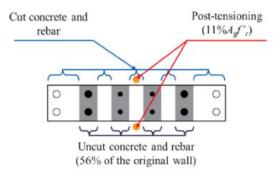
Wall Base Cross Section, (Basereh et al., 2020)
